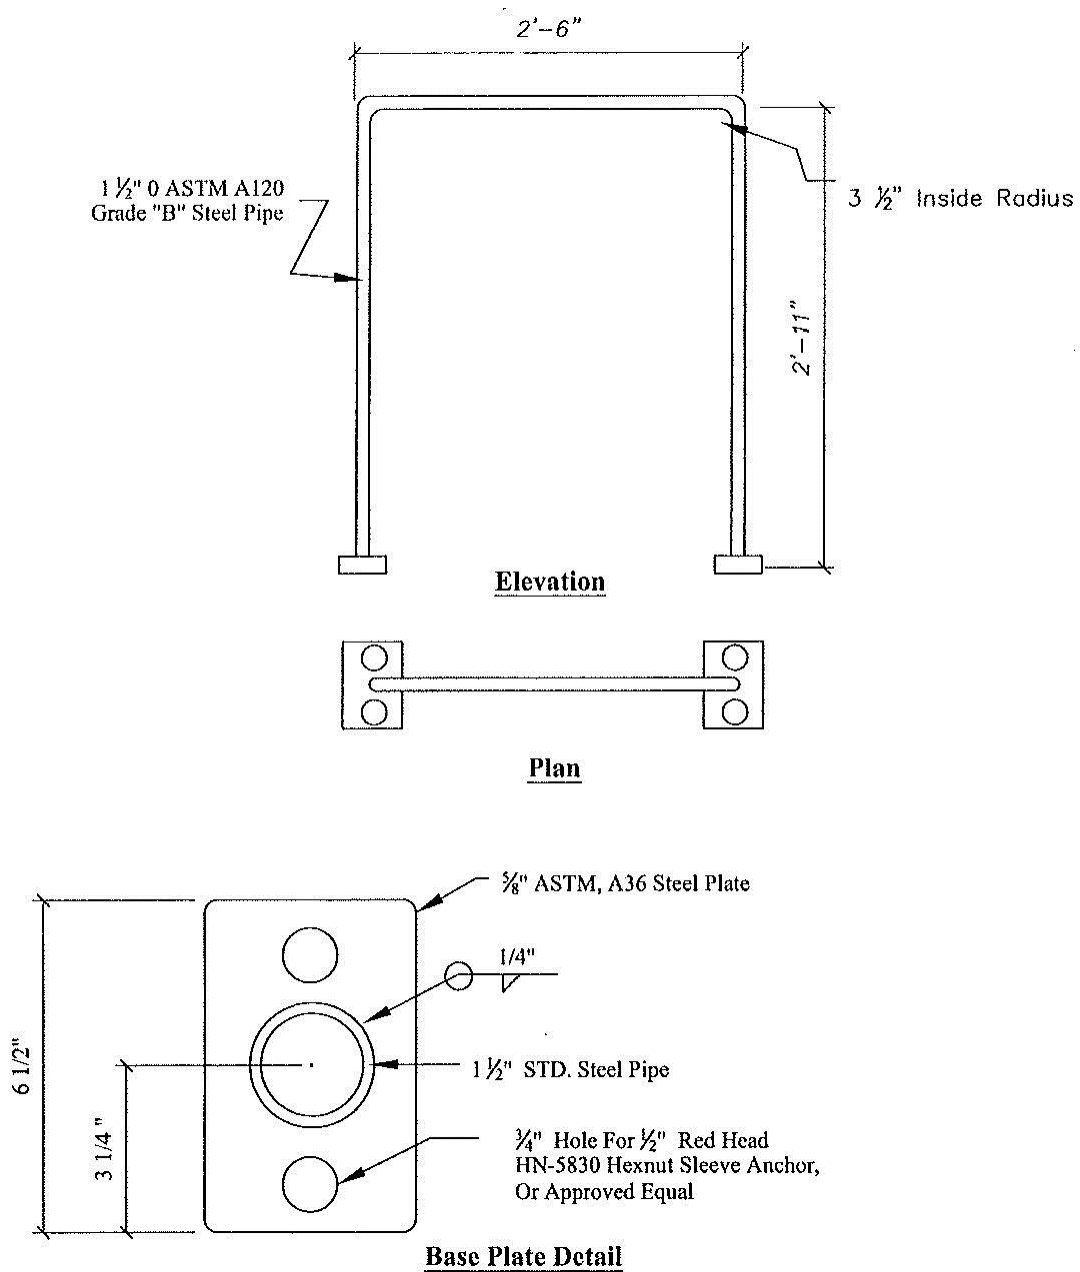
J.1 18.4.3.070.D.1. Bicycle Parking Rack
